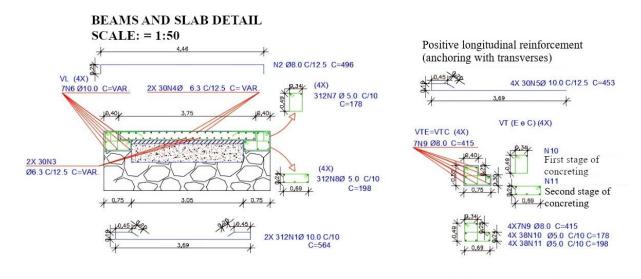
Schematic cross-section detail of the project to restore and reinforce the Pau Ferro Low-water Crossing.
